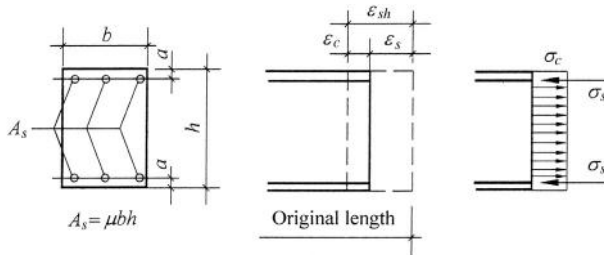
Uniform shrinkage of symmetrically reinforced concrete member
